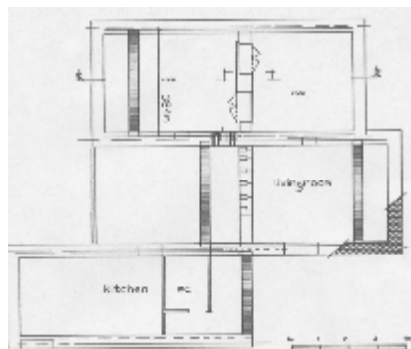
Plan of a Dwelling. The Vault Span Covers the width of the Room Thus Creating Usable Spaces
